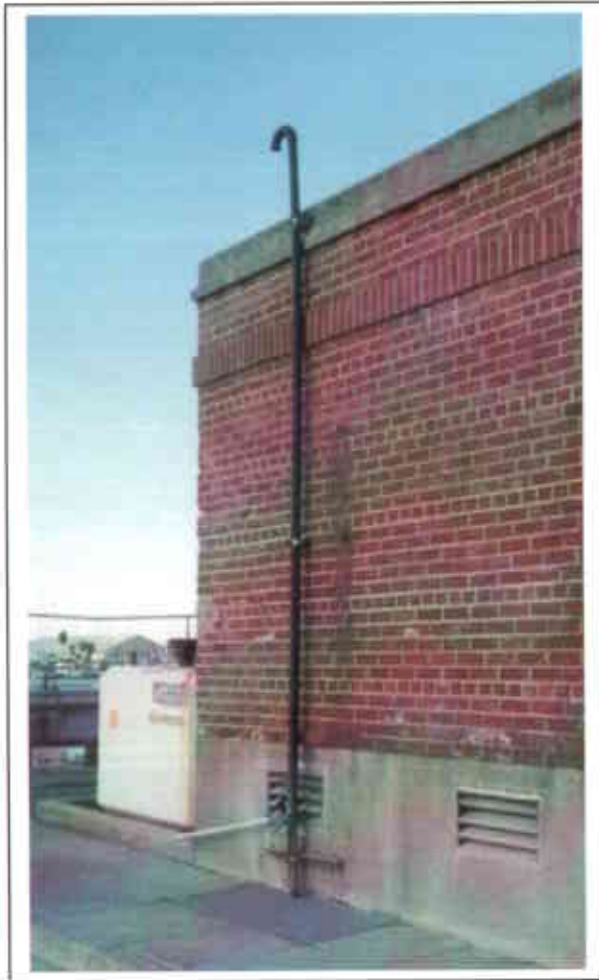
Filled in holes on side walk where piping had been removed. Southeast side of Building 44.
